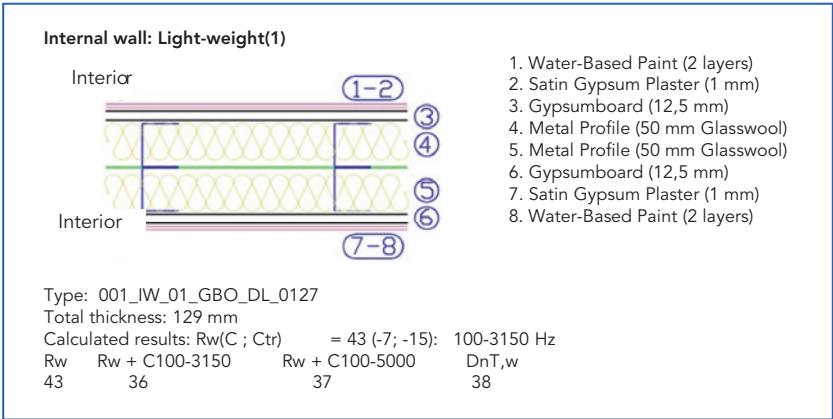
Light-weight wall. Construction details and sound insulation data.
